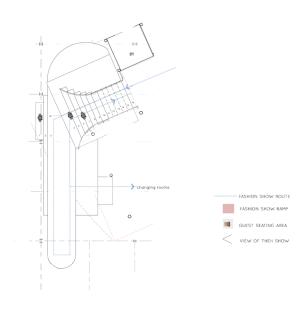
Ground floor plan of evening event layout- not to scale (Author, 2013)
